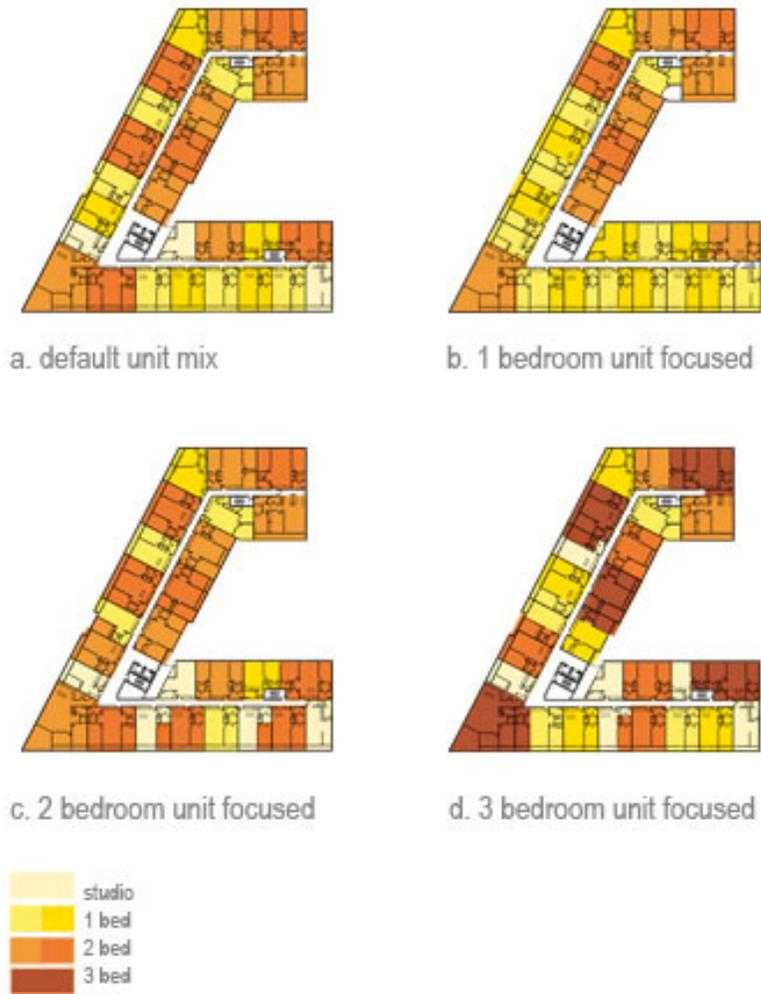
As the result of having tradable room zones from simple floor plans, a variation of unit mix can be provided on the floor. Over time, a rental apartment owner could change their unit mix to meet the market demand changes and helping the building to be competitive.
